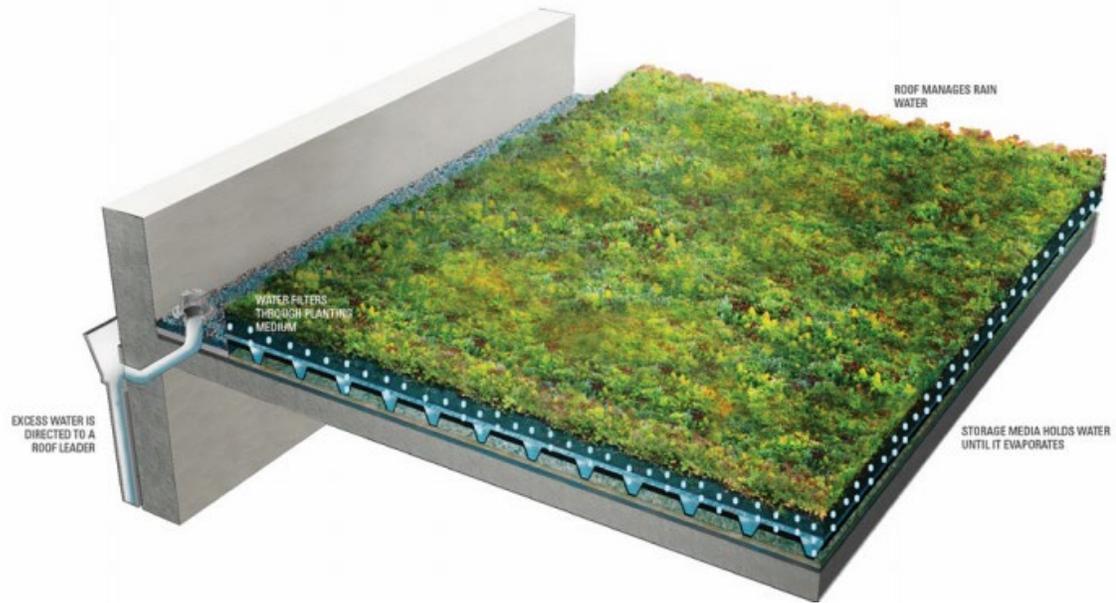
Layout of a green roof. Source: Philadelphia Water Department.
